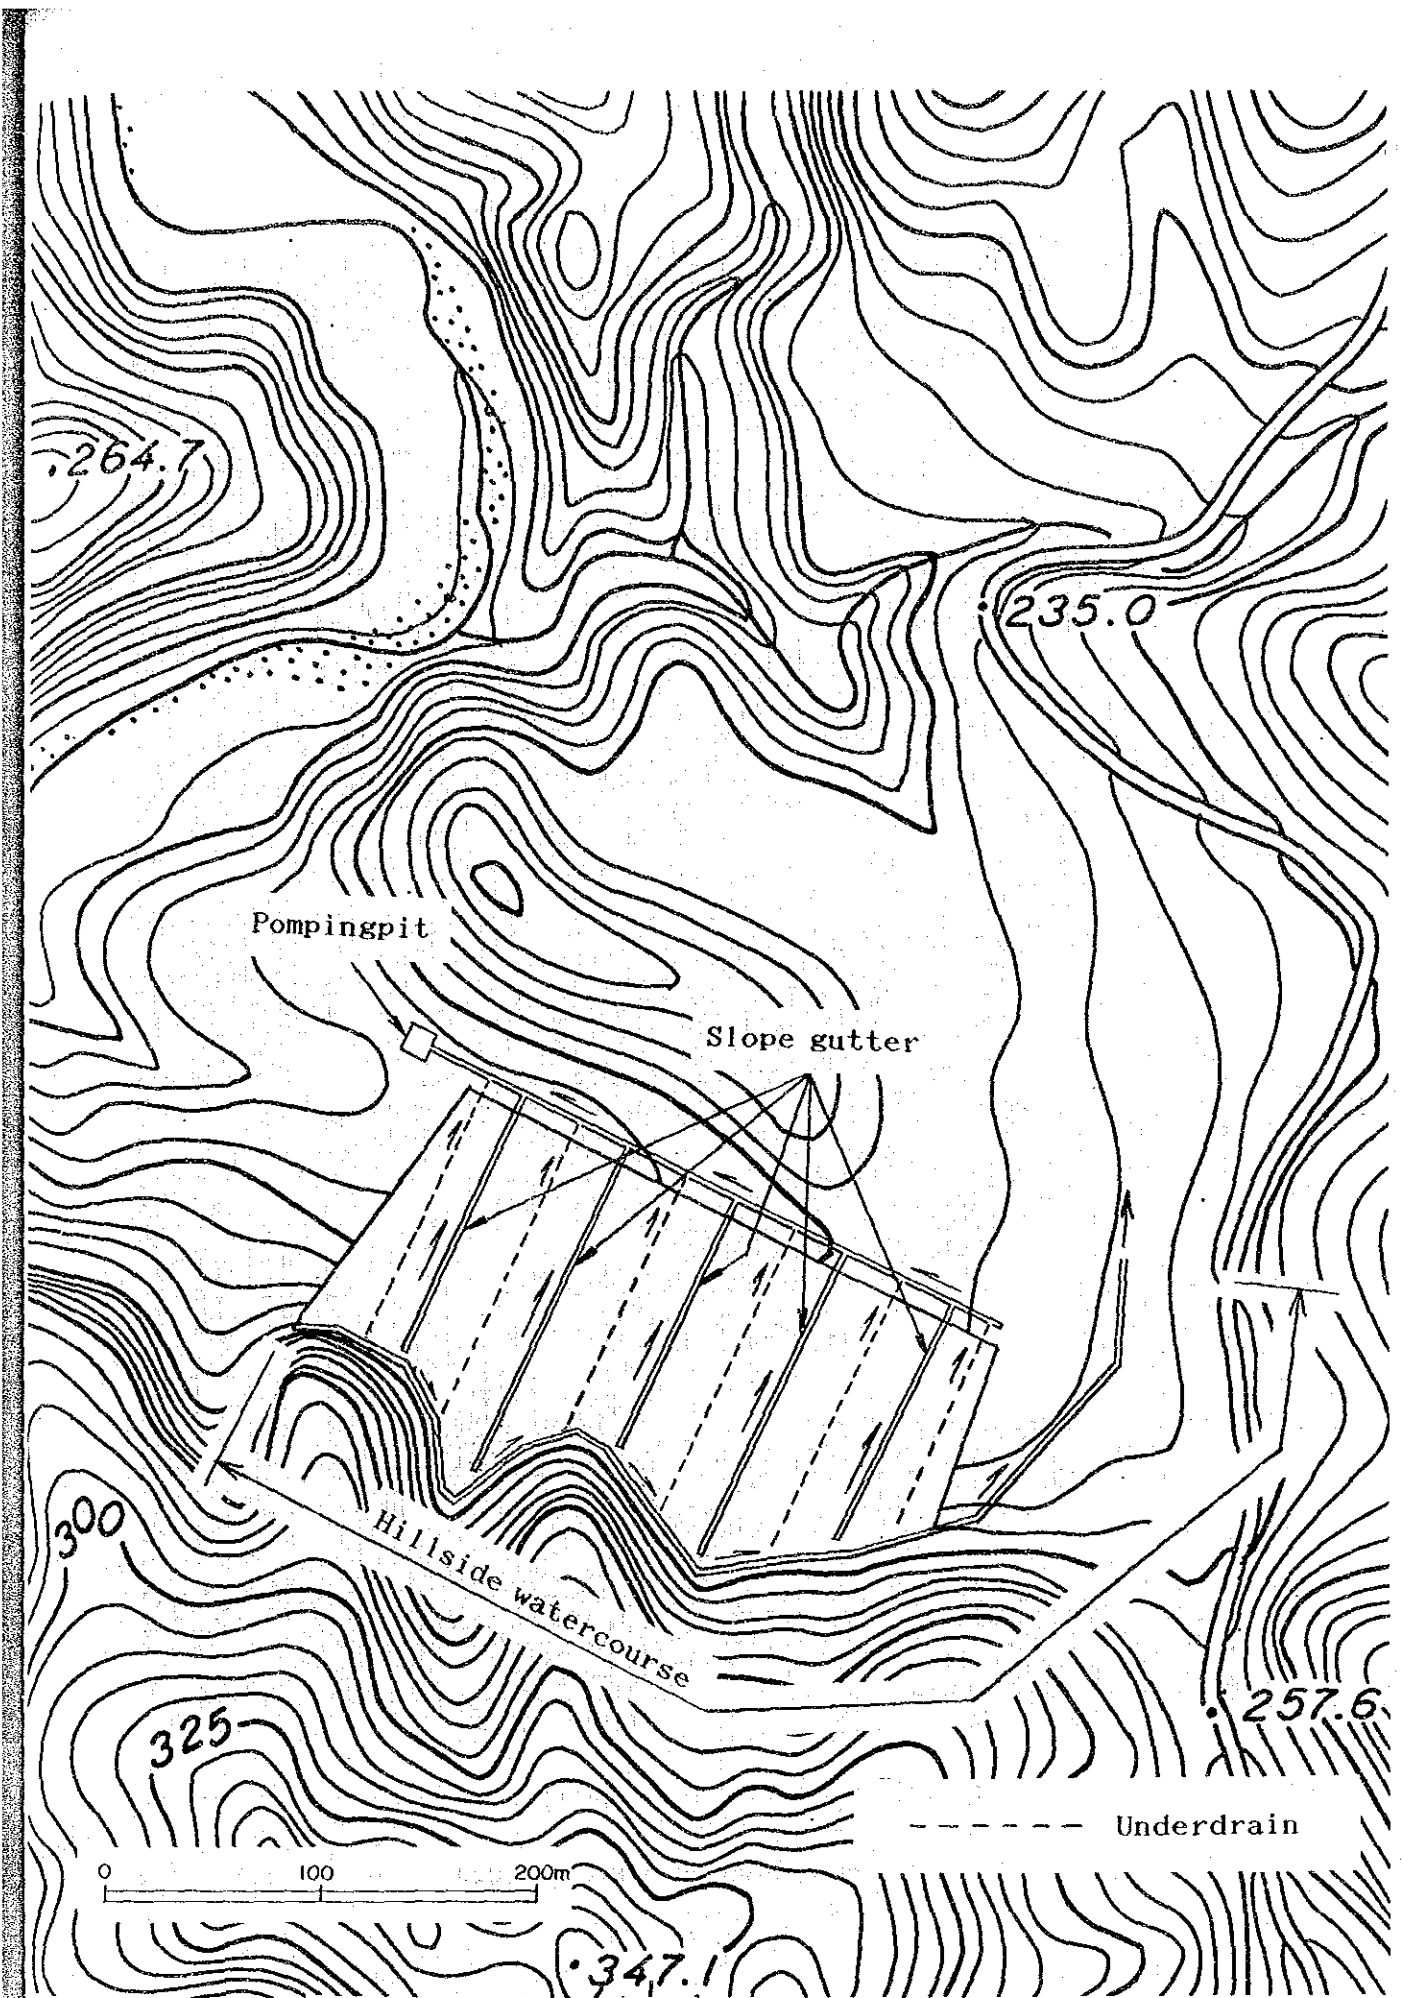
New El Coco Tailing Dam Drainage Plan
